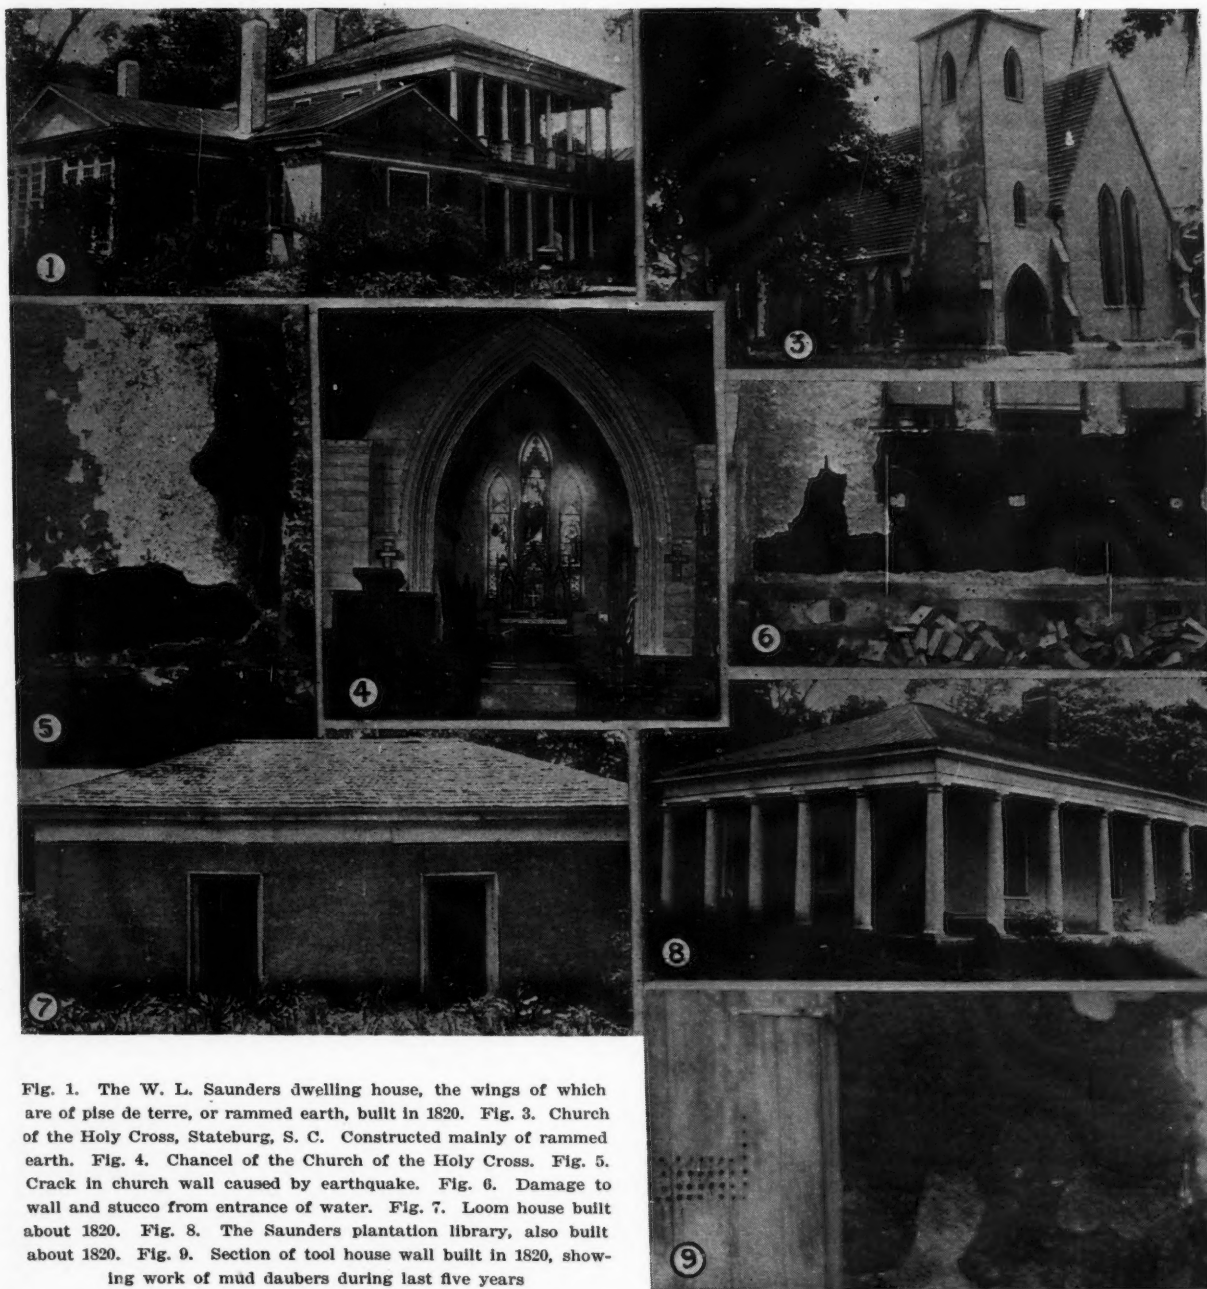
The W. L. Saunders dwelling house, the wings of which are of pisé de terre, or rammed earth, built in 1820. Fig. 3. Church of the Holy Cross, Stateburg, S. C. Constructed mainly of rammed earth. Fig. 4. Chancel of the Church of the Holy Cross. Fig. 5. Crack in church wall caused by earthquake. Fig. 6. Damage to wall and stucco from entrance of water. Fig. 7. Loom house built about 1820. Fig. 8. The Saunders plantation library, also built about 1820. Fig. 9. Section of tool house wall built in 1820, showing work of mud daubers during last five years
